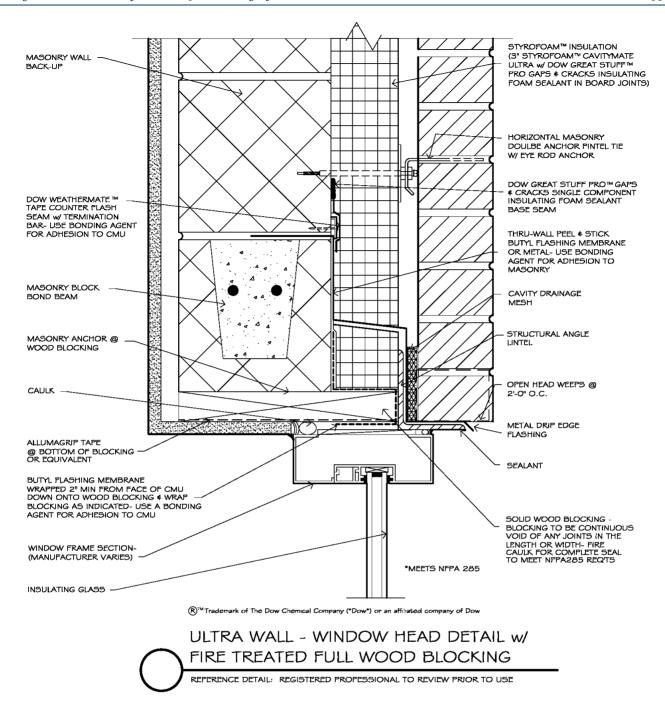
Window / Door Header Detail with FR Wood Blocking
